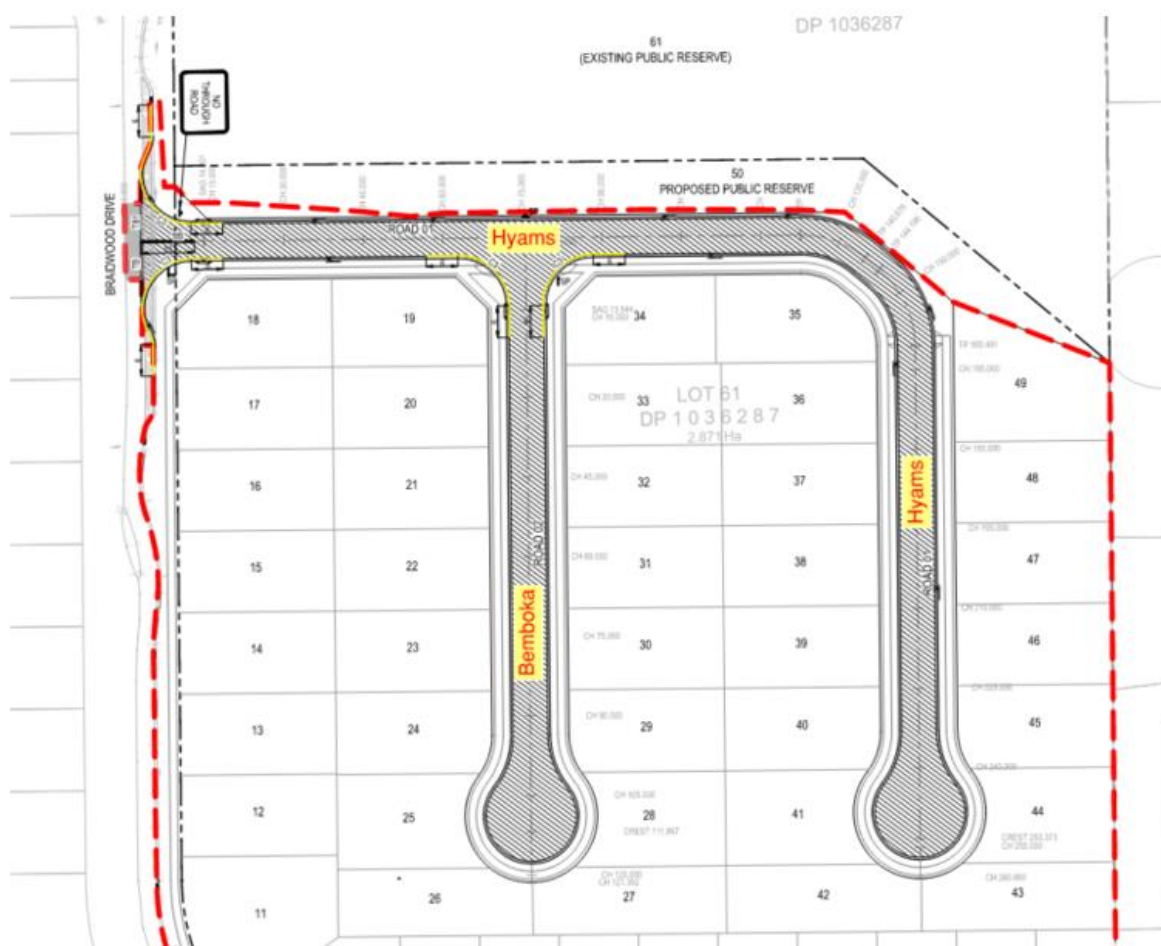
Subdivision plan showing location of proposed two new roads “Hyams and Bemboka Street”
